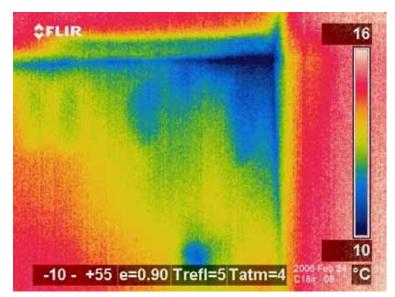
Thermal Image of External Wall with Missing Insulation on Site in Manchester
